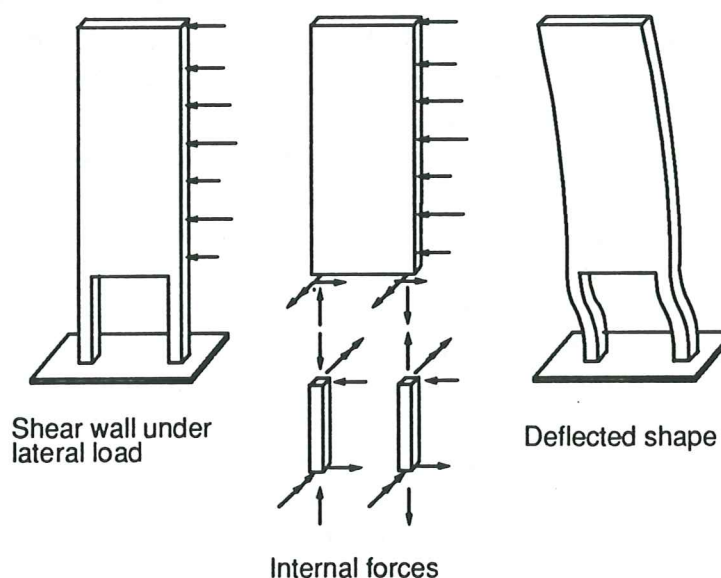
Structural behavior of a shear wall supported on two columns and carrying lateral loads.
